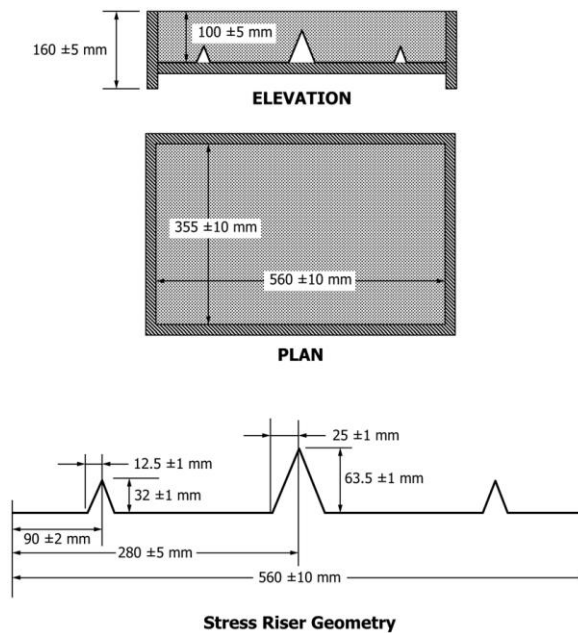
Specimen and Stress Riser Geometry (ASTM C 1579 - 13)
